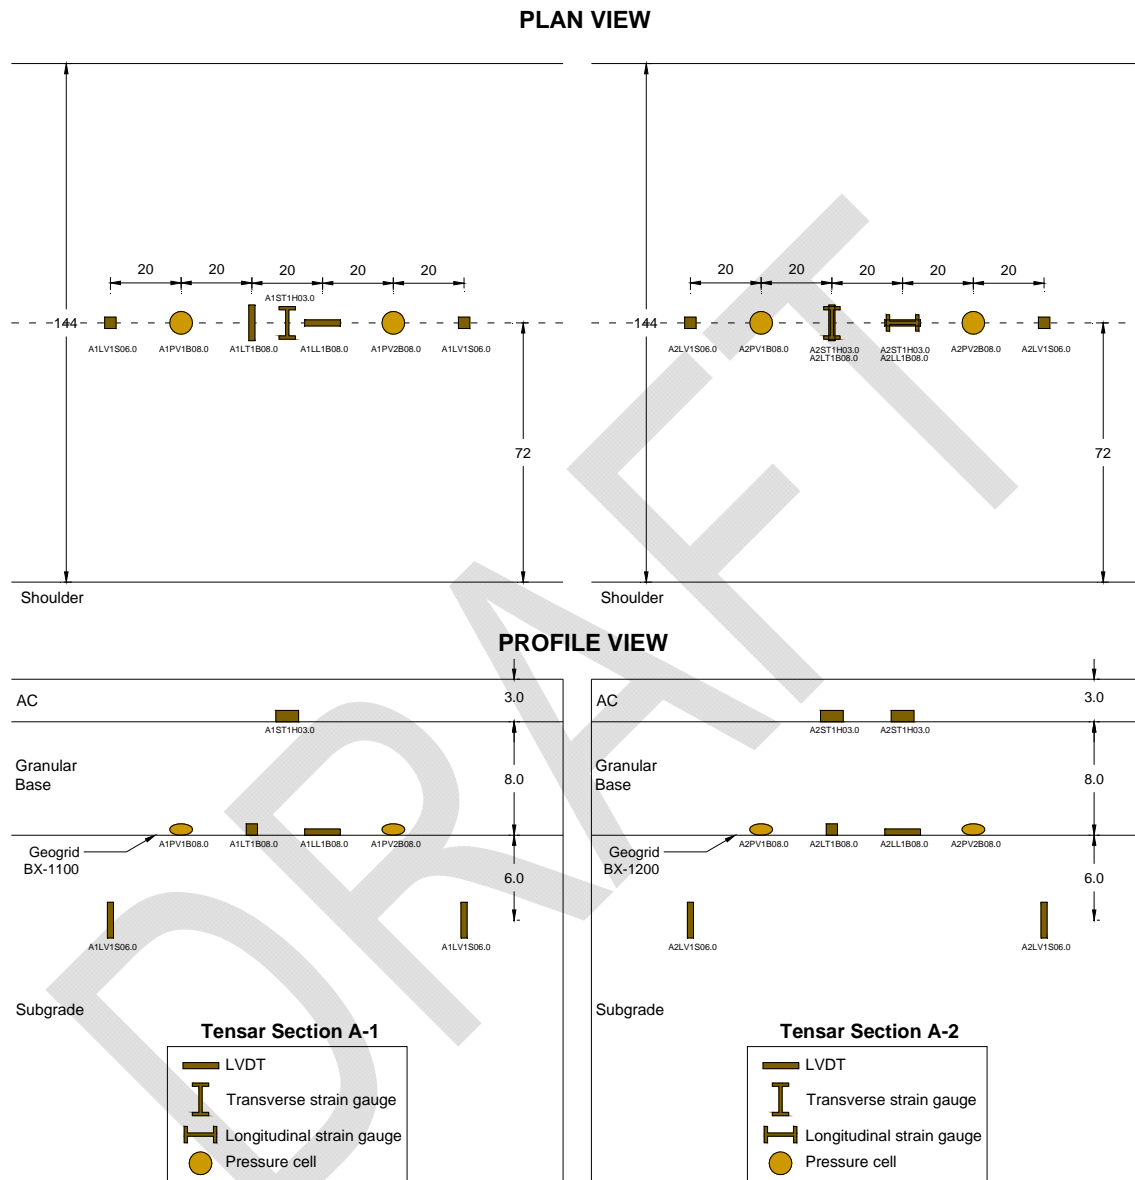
Plan and profile view of pavement structure and instrumentation of thin Section A-1 and A-2 at ATREL-UIUC
